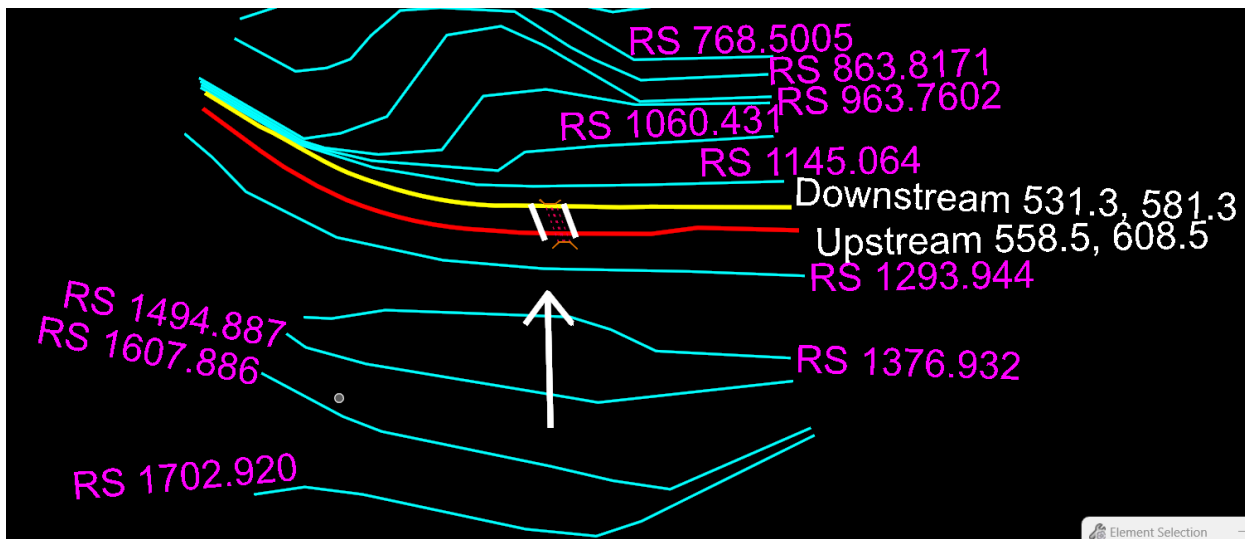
Outline of Bridge Placement Relative to Roadway Stations in OpenRoads
